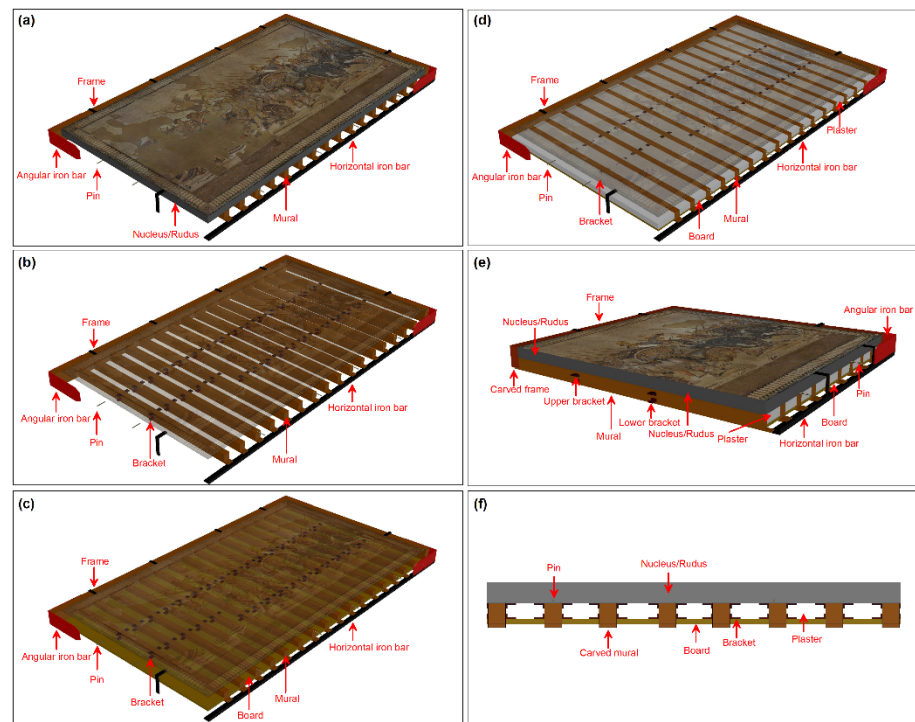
Hypothesis 2: locations of vertical beams (a), locations of anchoring brackets (b), locations of closing boards (c), complete support system (d), cross-section (e) and longitudinal section (f).
